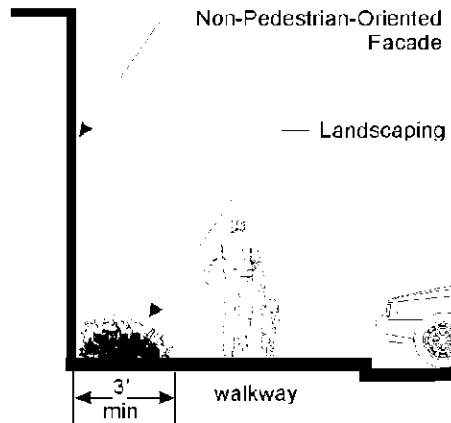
C.1.1-2 Provide landscaping between walkways and structures
